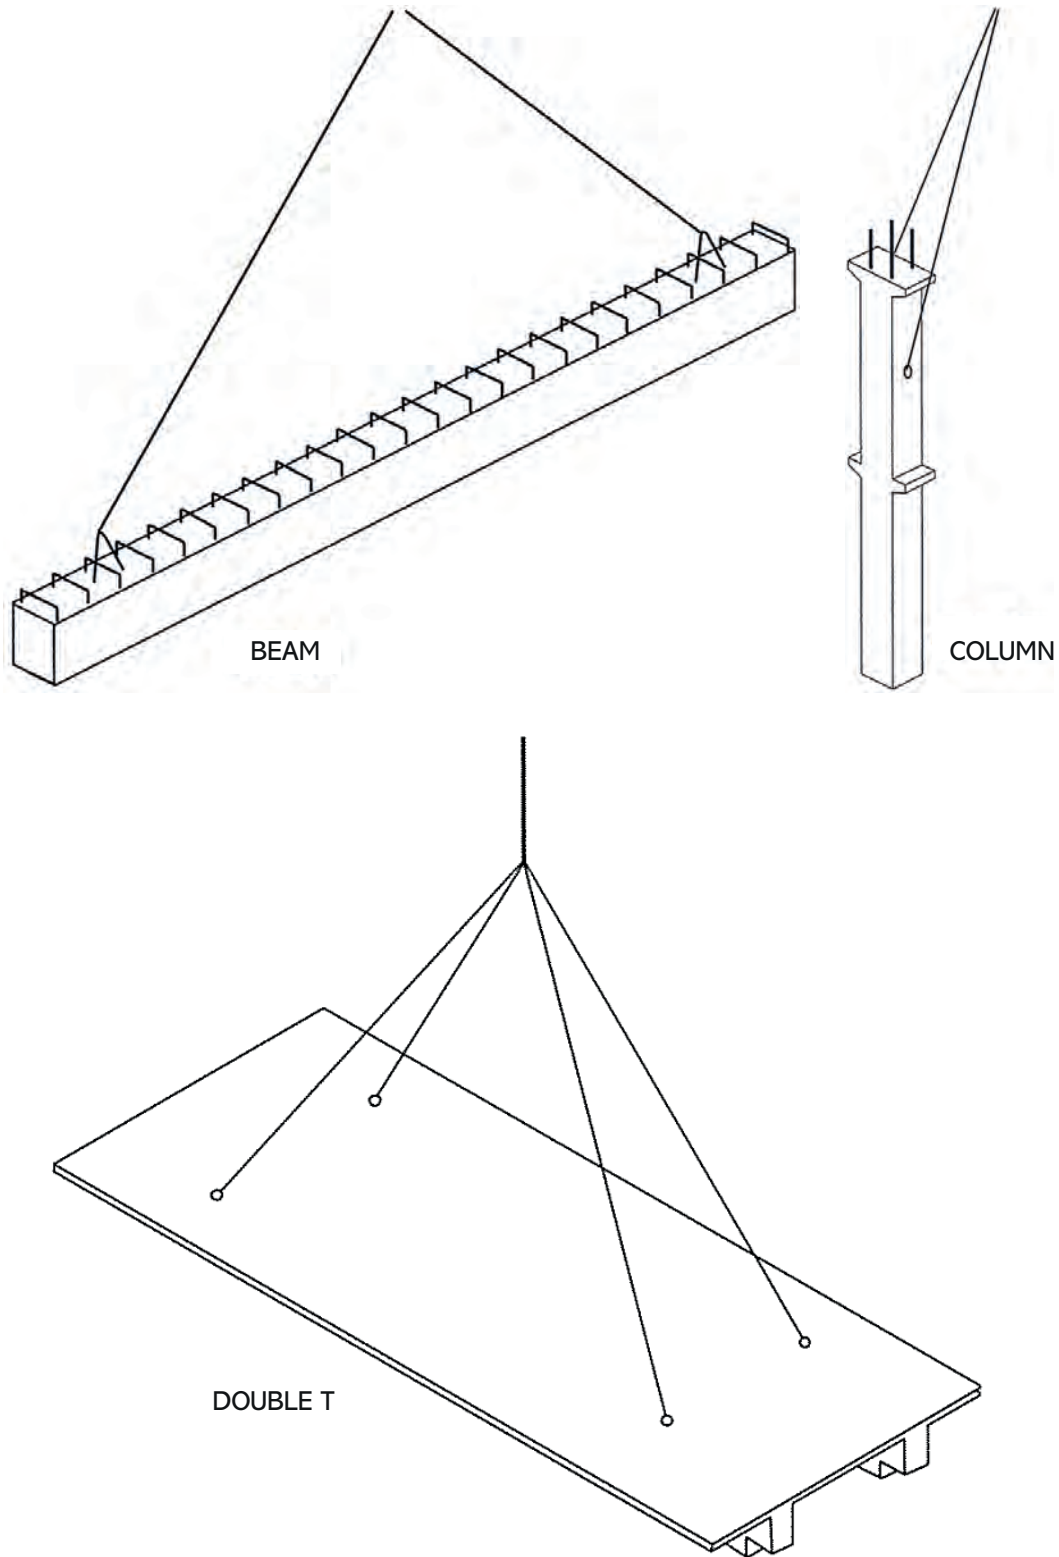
Lifting of precast beam, column and slab (CIS 9: CIDB)
